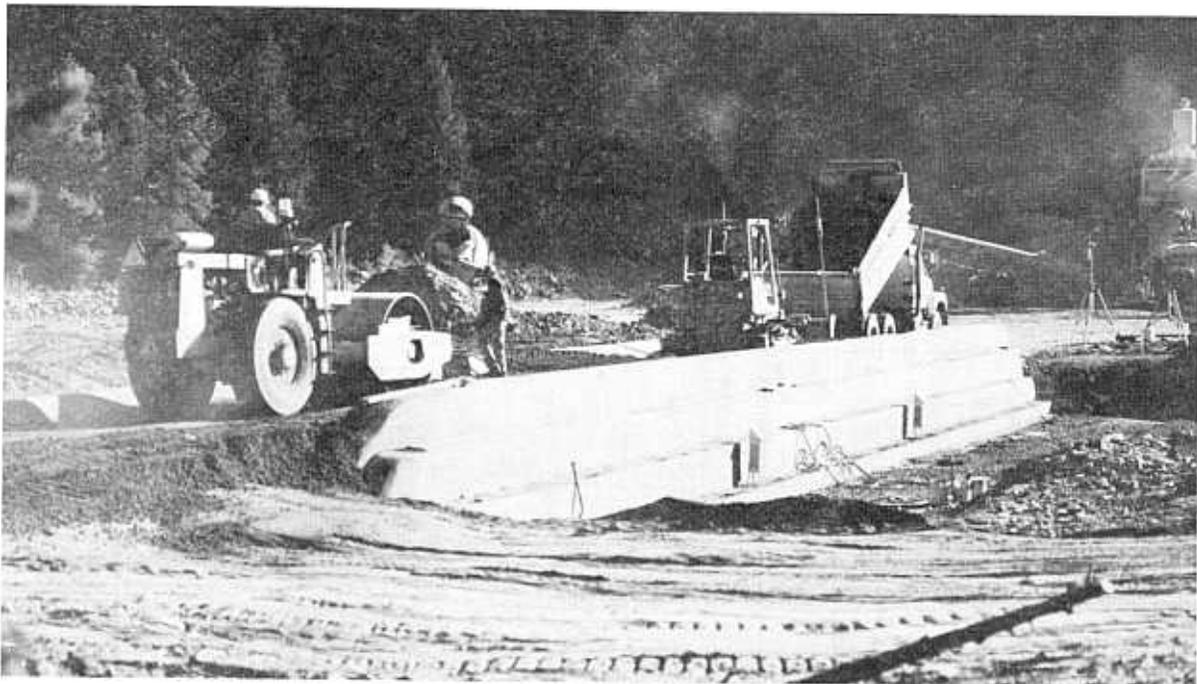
View of Upper Stillwater Dam RCC test placement. Sequence of RCC construction showing concrete being dumped by an end dump truck, spread by a dozer, and compacted by a vibratory roller. P801-D-80873
